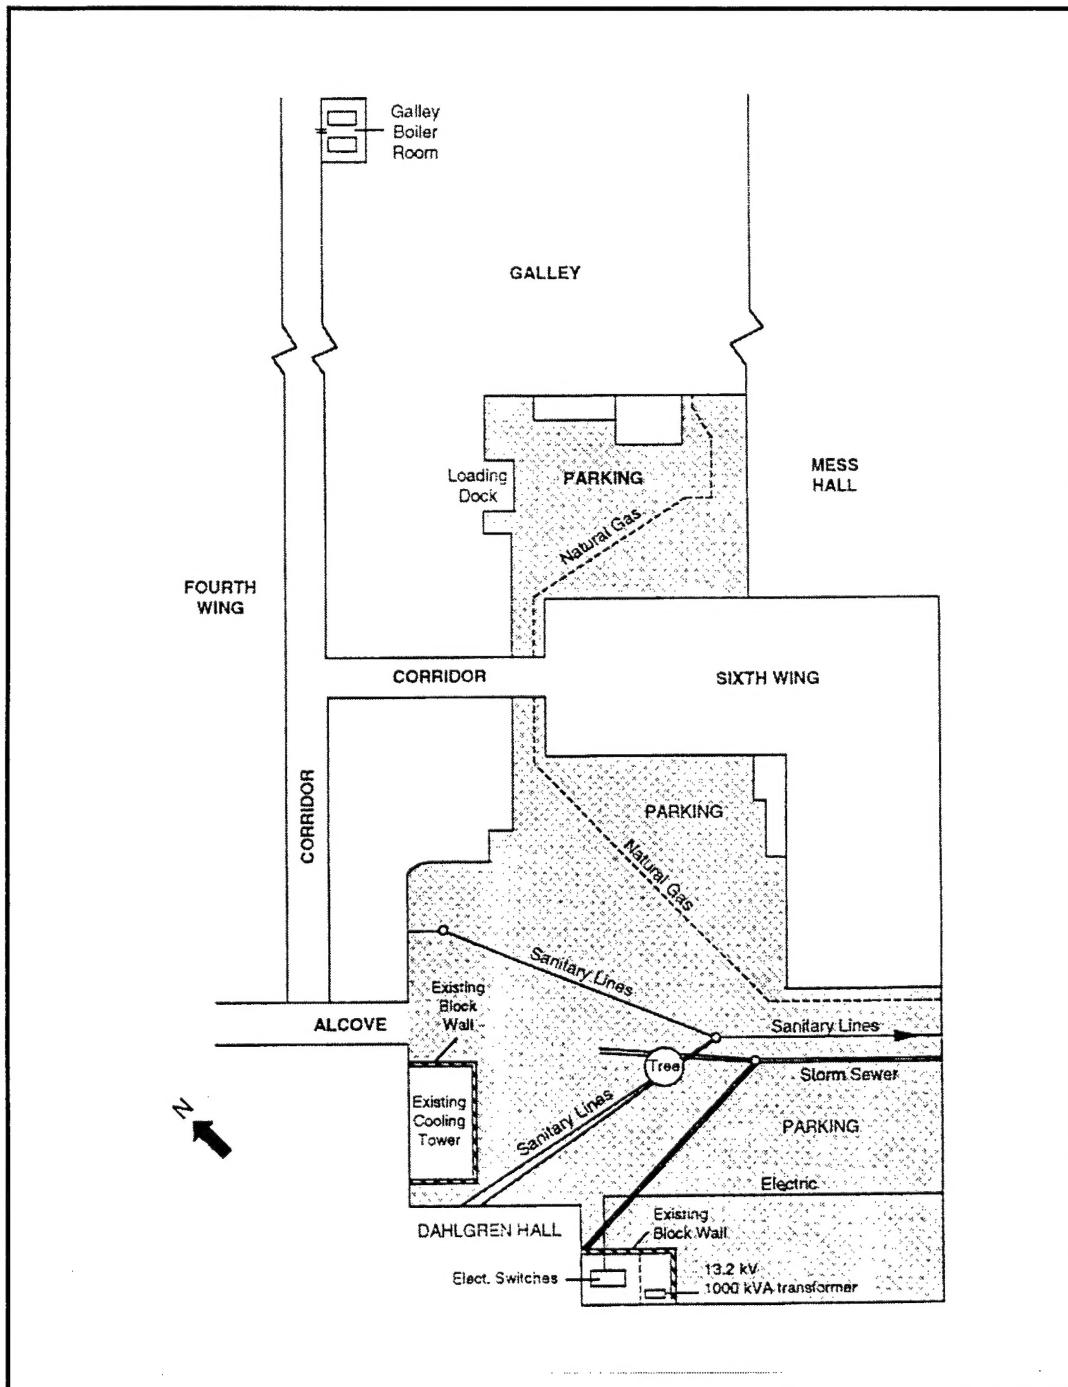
U.S. Naval Academy Dormitory/Gallery site layout.
